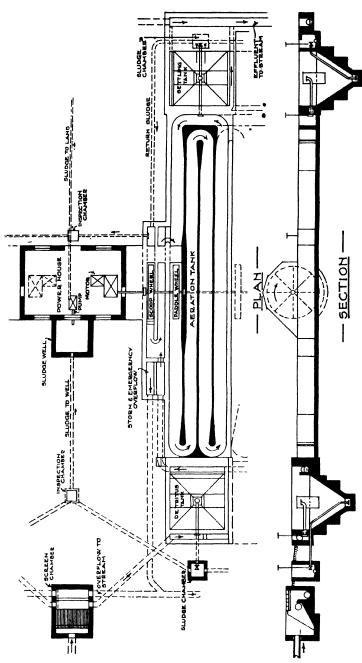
Plan and section showing partial lay-out of sewage-disposal works ('Bio-aeration' system).
